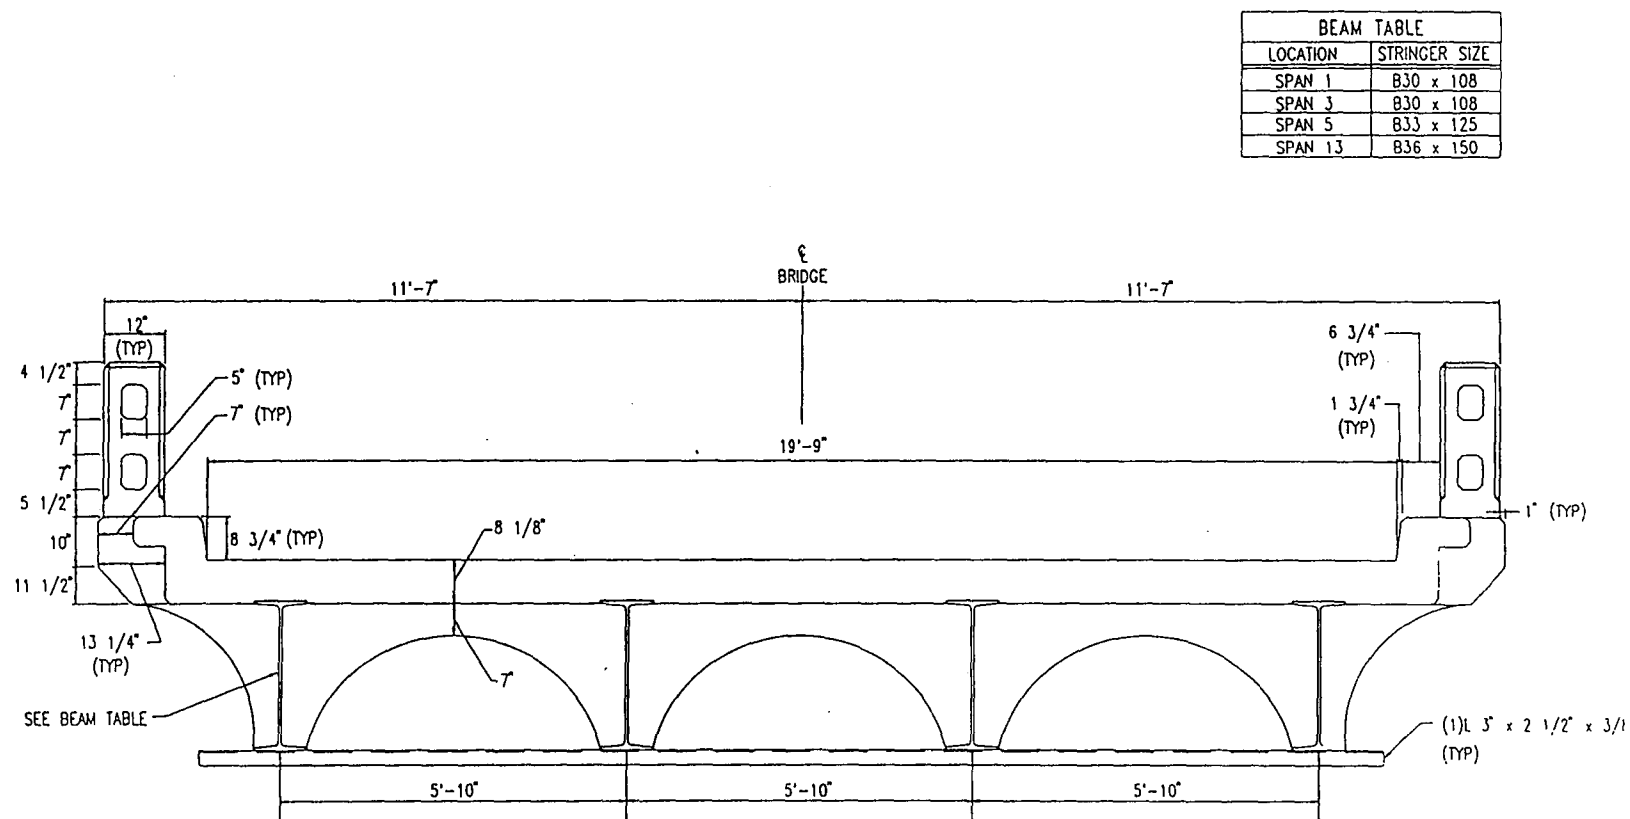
Typical Cross Section at Stringer Approach Spans
